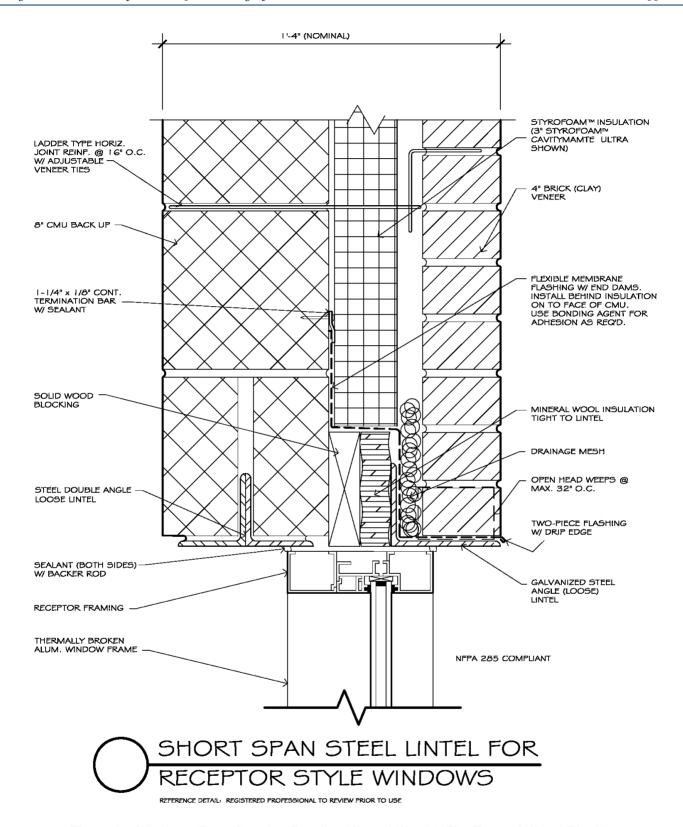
Window / Door Opening Detail w/Mineral Wool & Fire Treated Wood Blocking
